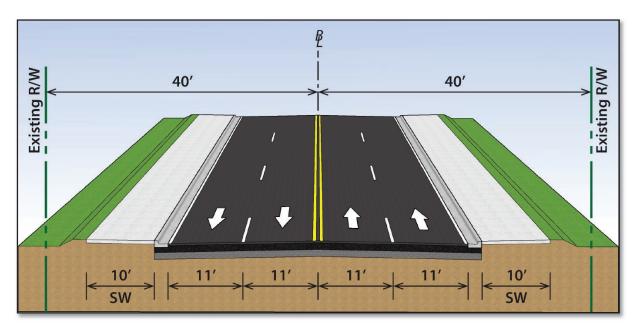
Proposed Typical Section – Whiting Street (Jefferson Street to North Brush Street)
